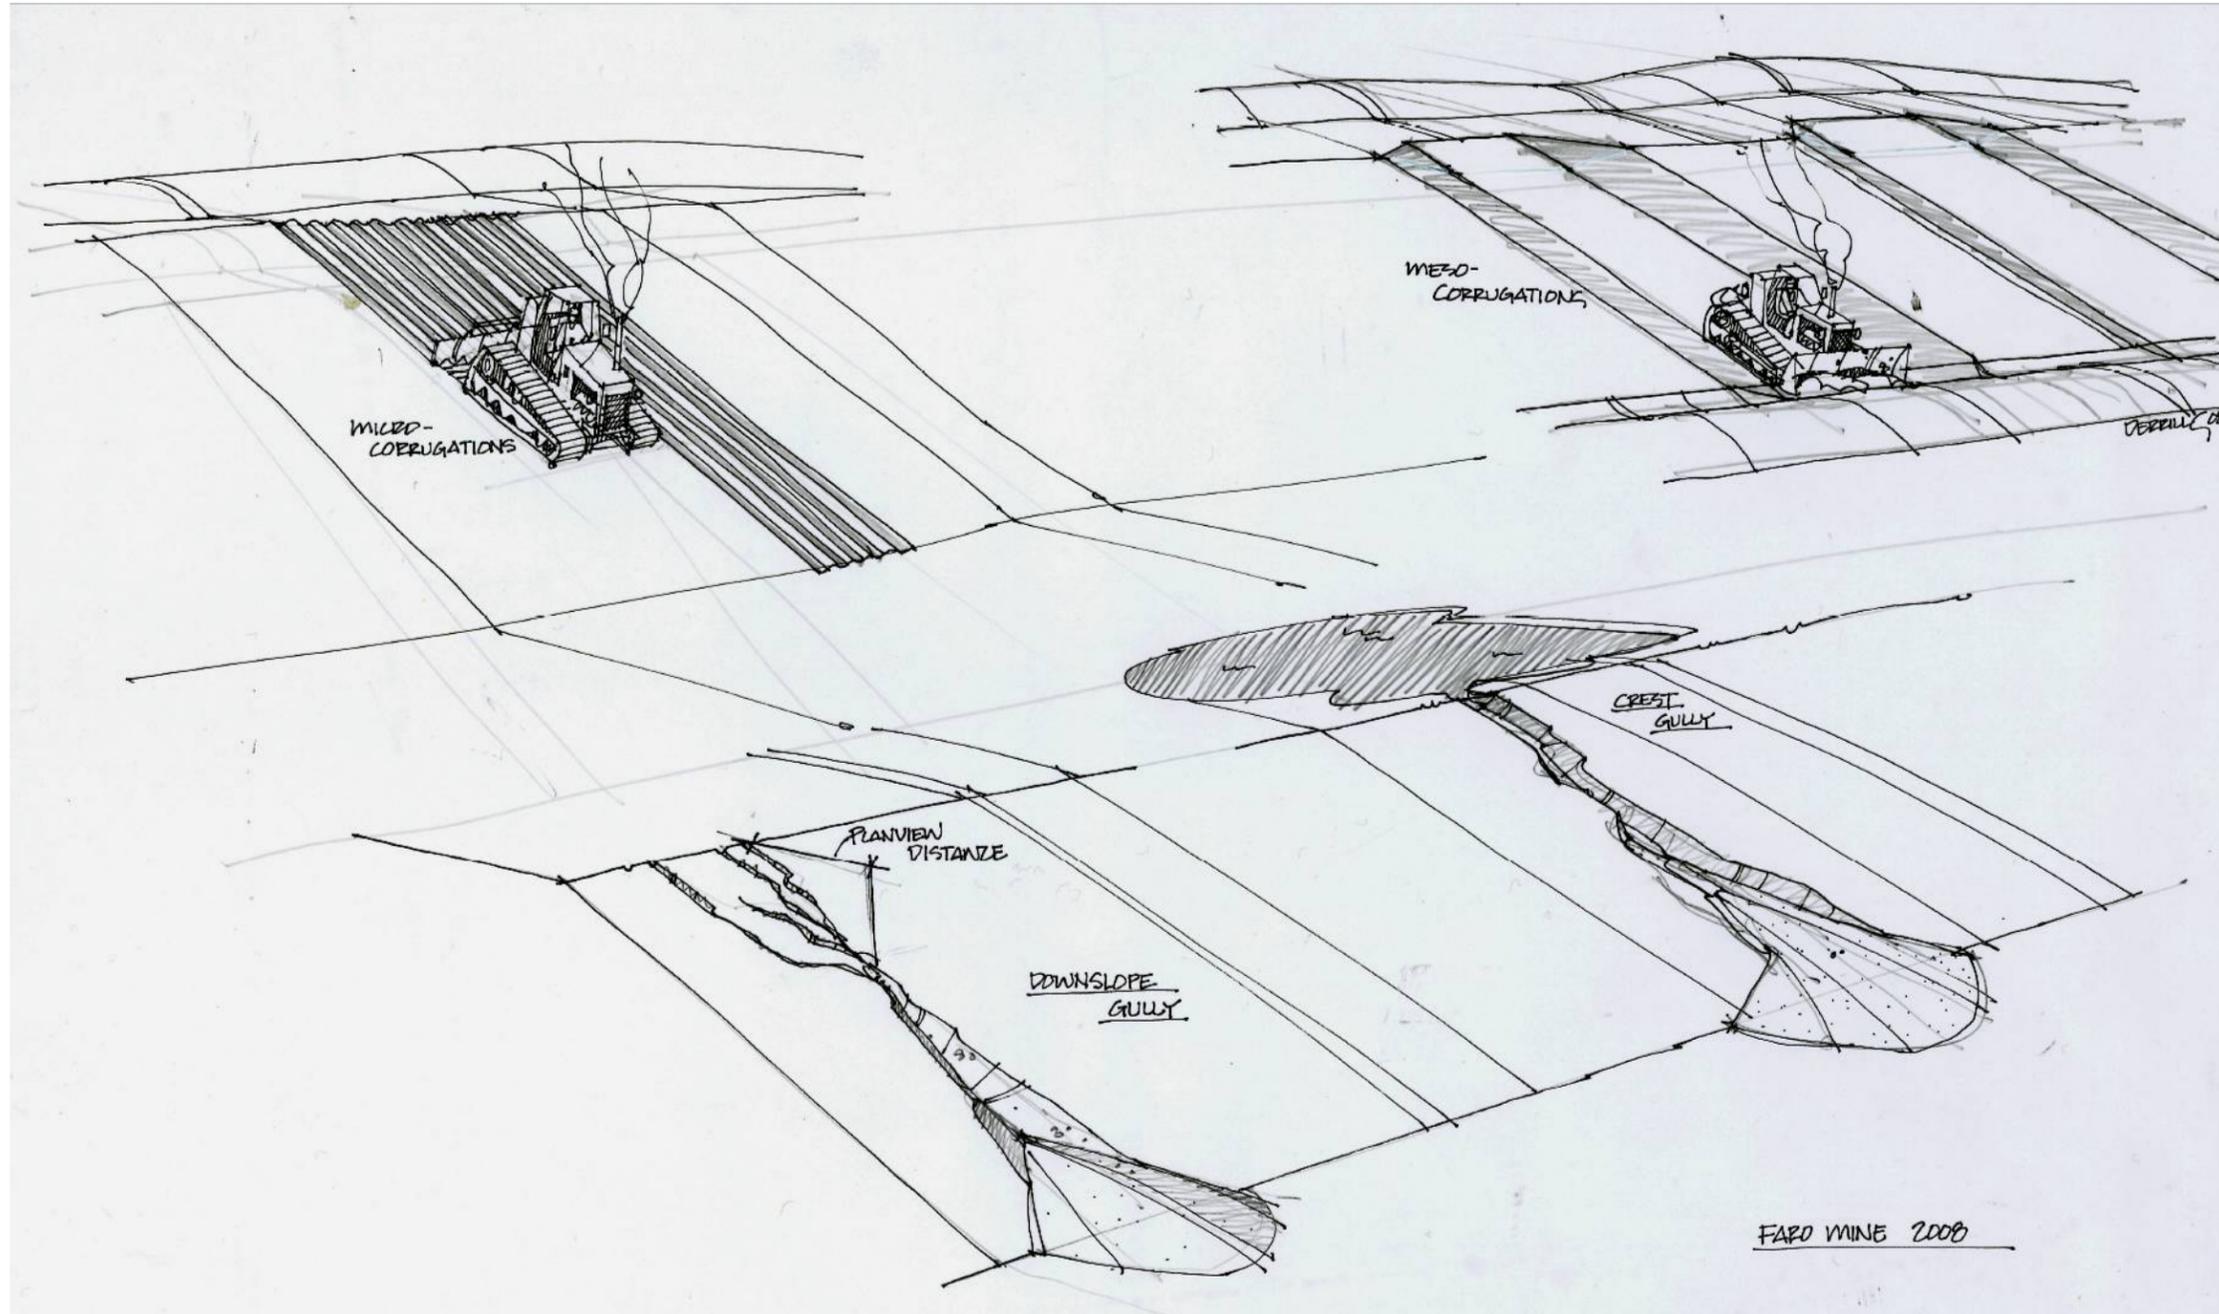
Schematic views of microcorrugation, meso corrugation, and gully definitions (downslope gully showing definition of planview distance, and crest gully caused by overtopping of crest by overland flow from plateau, beach, road, or ramp).
